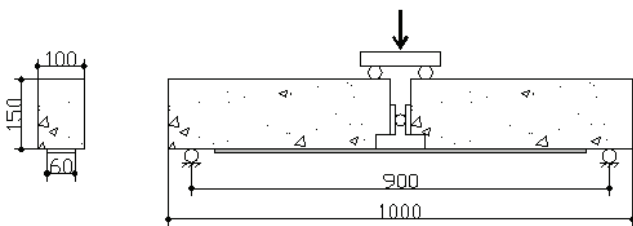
Shape and Dimensions of Test Specimen (mm)
